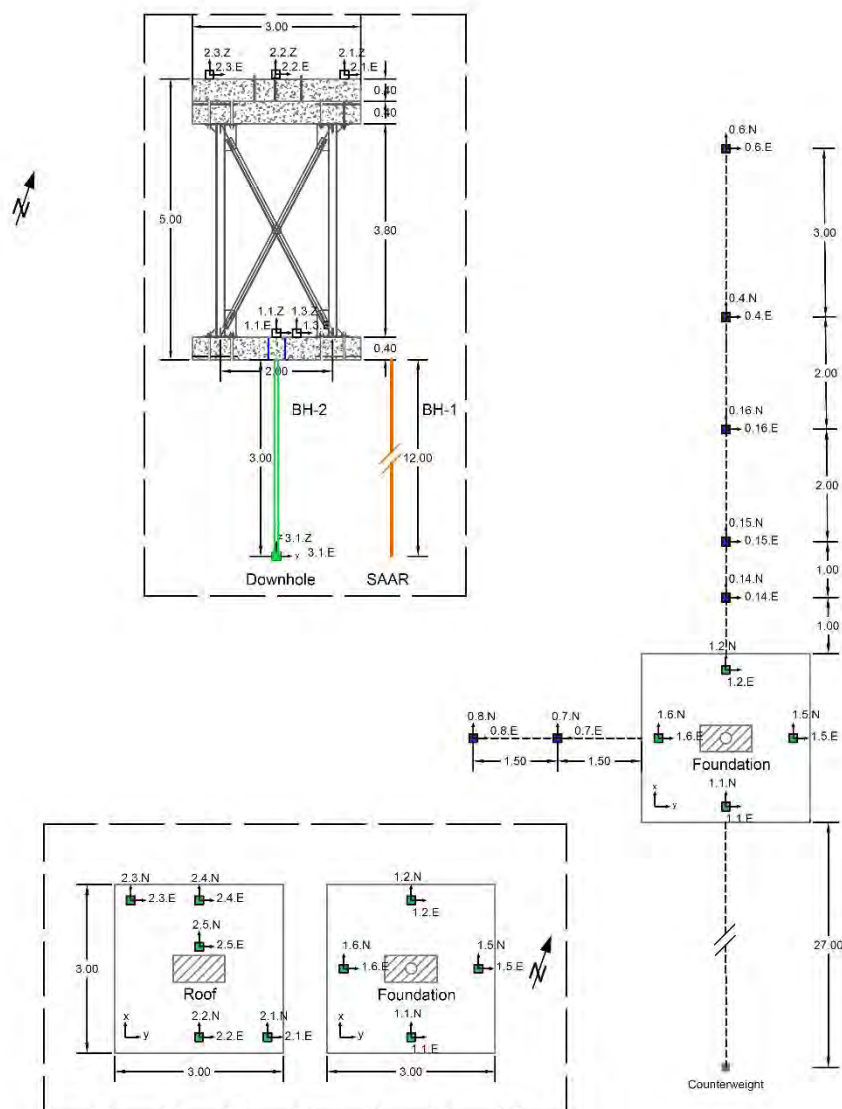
A cross-section and a plan view of the instrumentation layout of EUROPROTEAS structure and foundation soil
